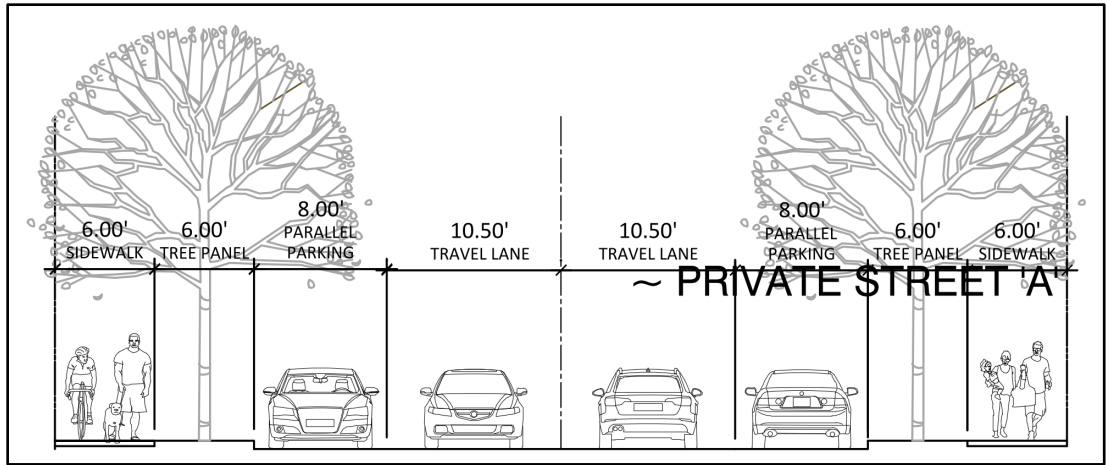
Proposed Cross-Section for Blue Segment of Street A, as conditioned.
